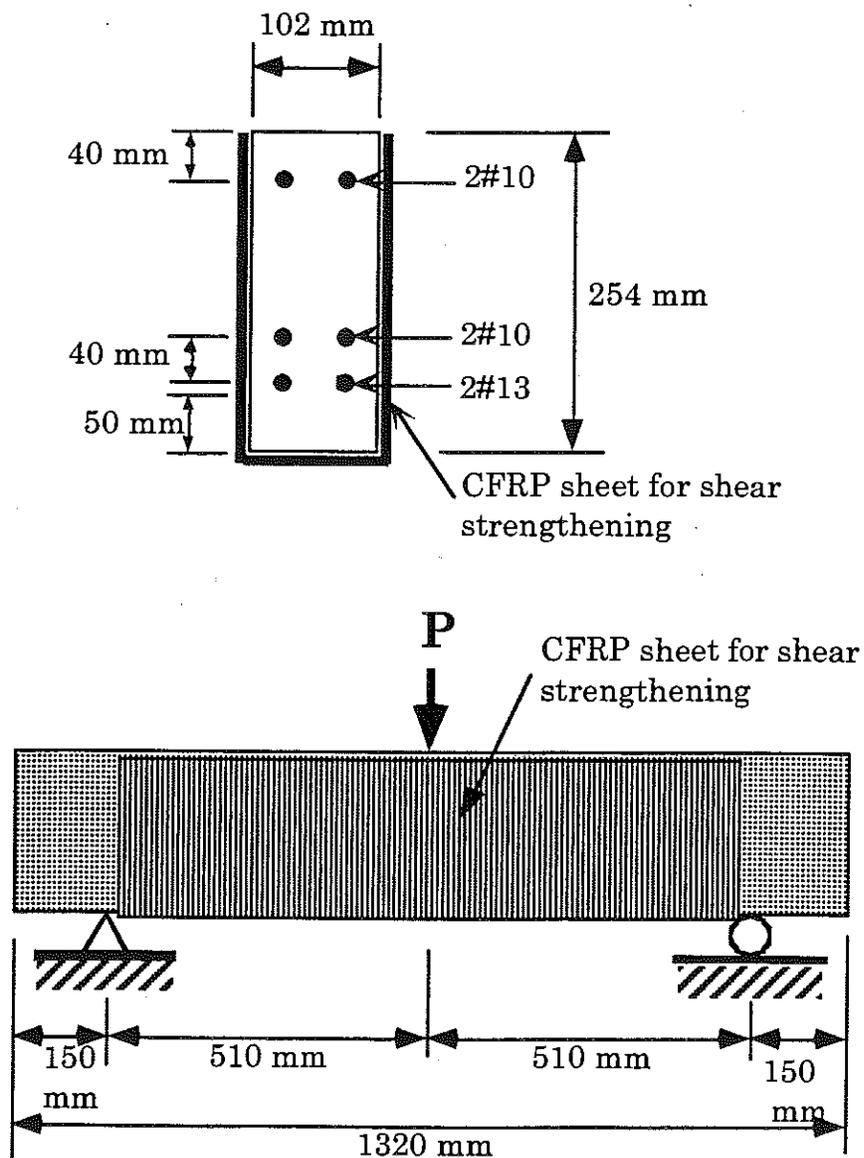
Typical cross section and loading arrangement for rectangular beams.
